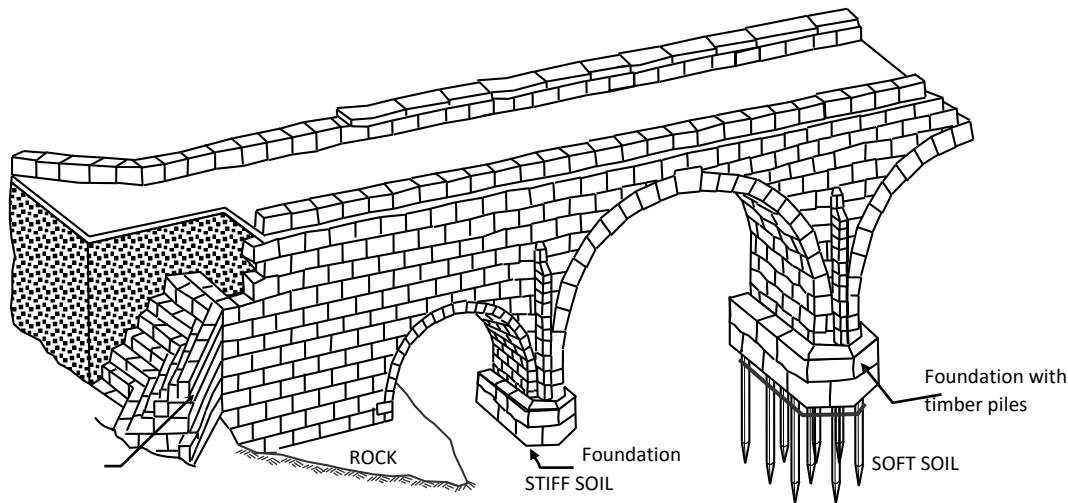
The foundation system of a stone bridge (Ural et al., 2008)
